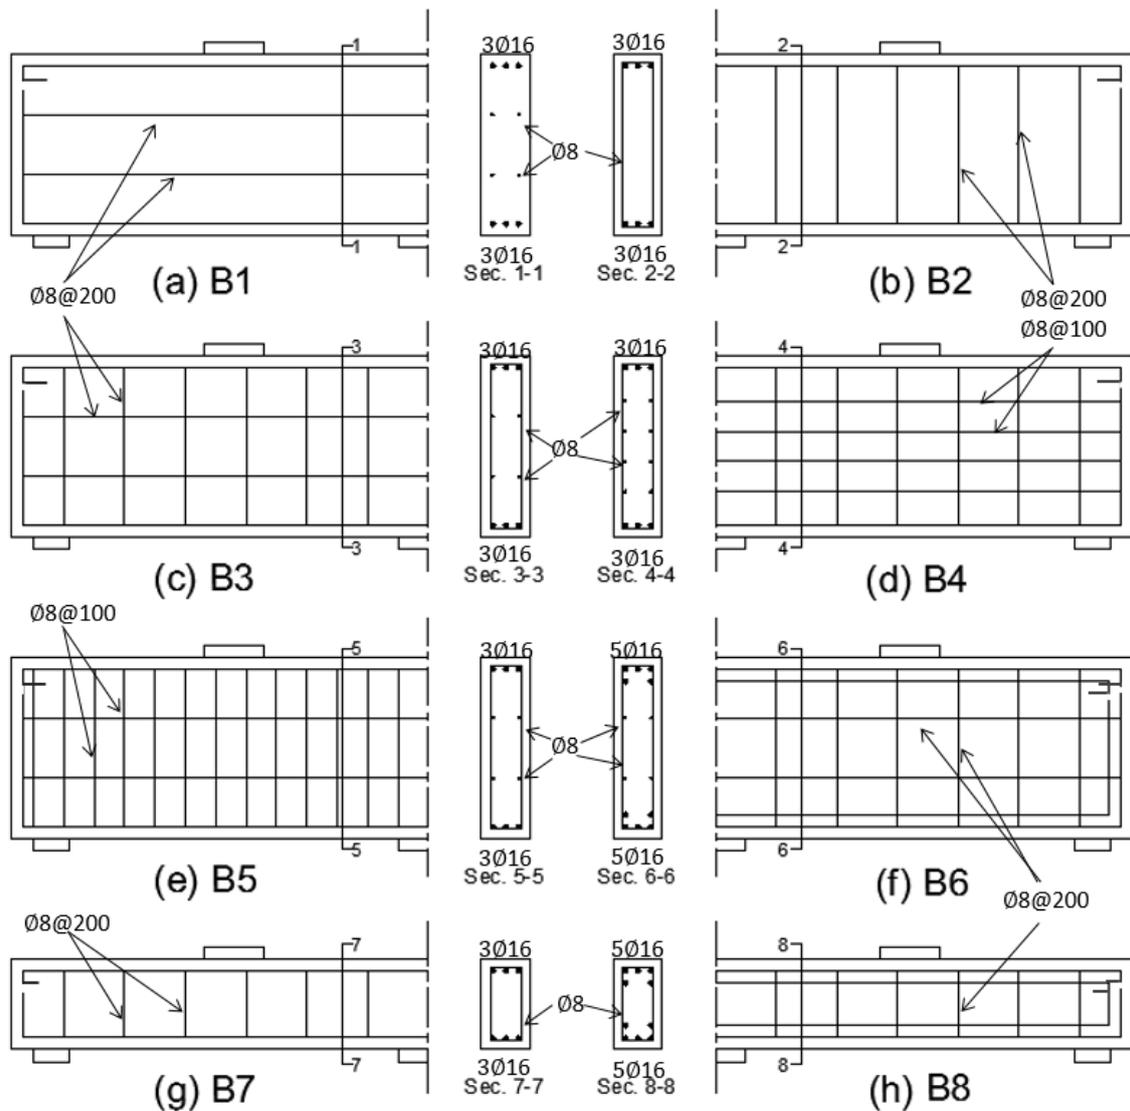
Reinforcement details of beams tested by Khatab et al.^[17]
